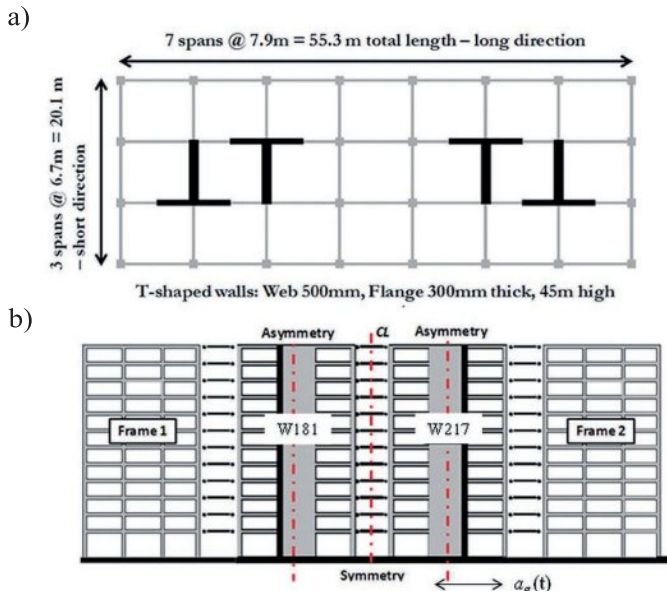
Prototype structure: (a) plan layout; (b) short dimension model simplification
